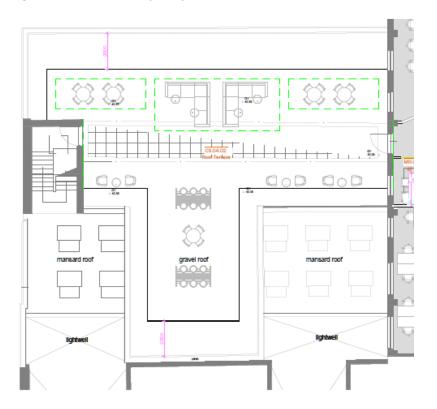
Proposed roof terrace at 24-28 Bloomsbury Way
